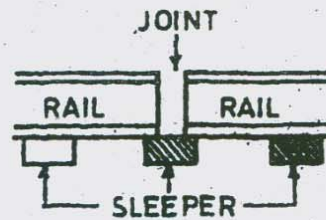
(A) SUPPORTED RAIL JOINT
